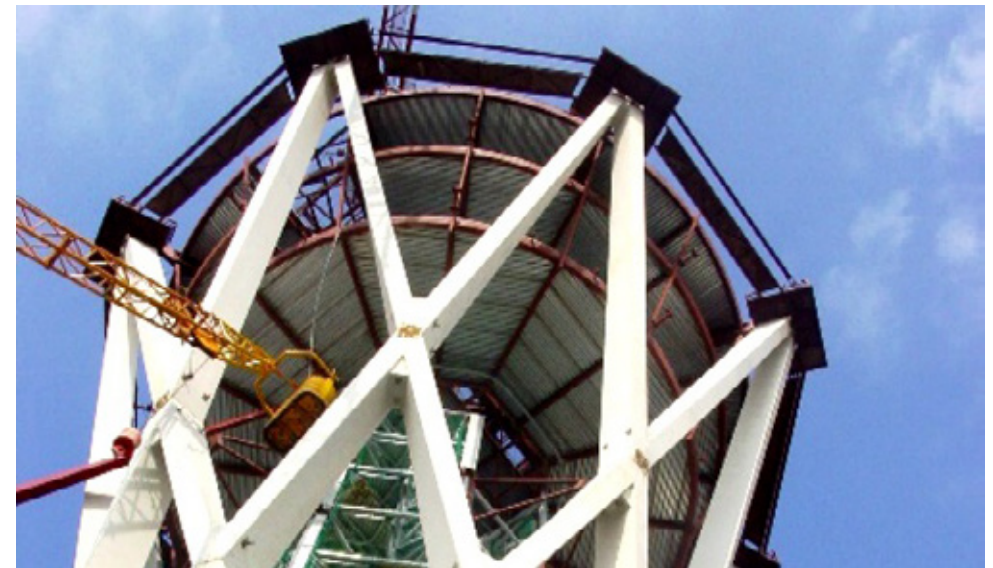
The external concrete exoskeleton, aluminium stairtower and steel structure of the traffic control rooms
